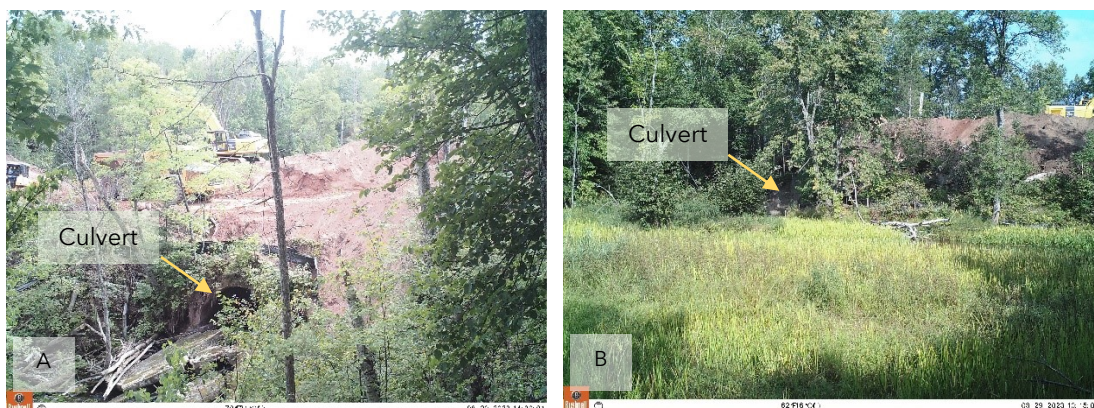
Nebagamon Creek abandoned railroad grade excavation site. A: facing upstream, B: facing downstream. (Photo credits: Wisconsin DNR)
